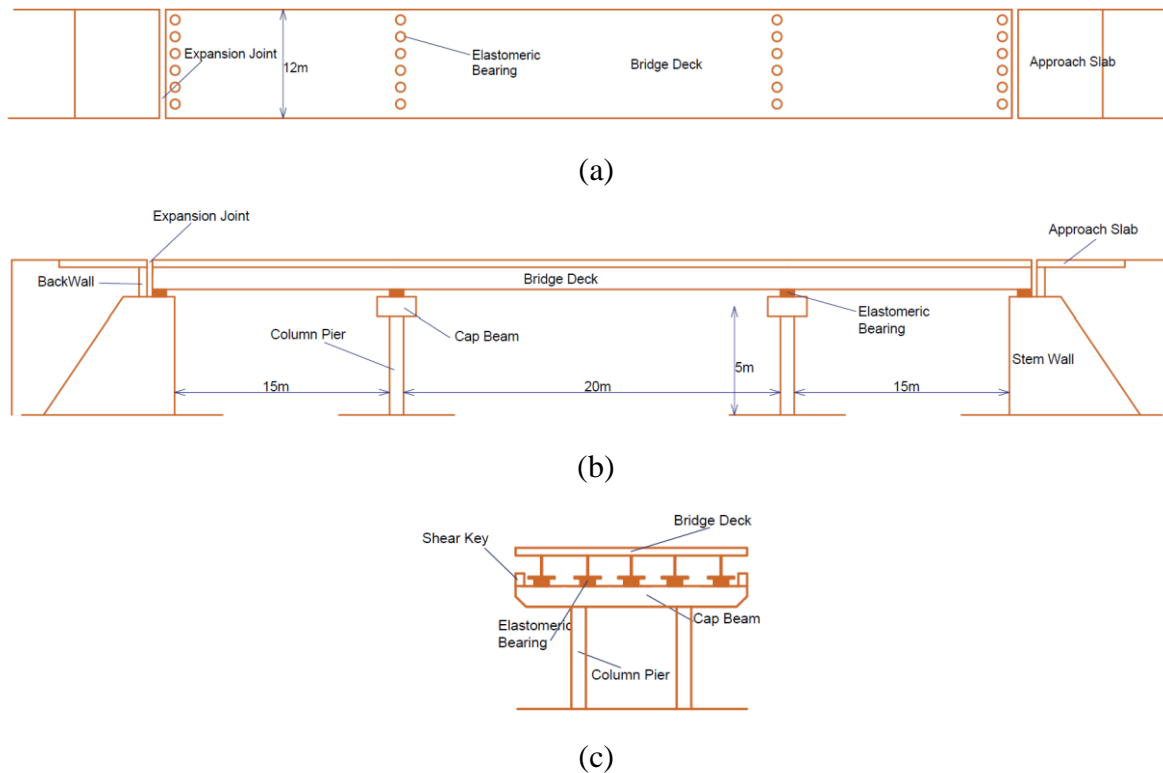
The model bridge, a) plan, b) longitudinal view, c) bent transverse section.
